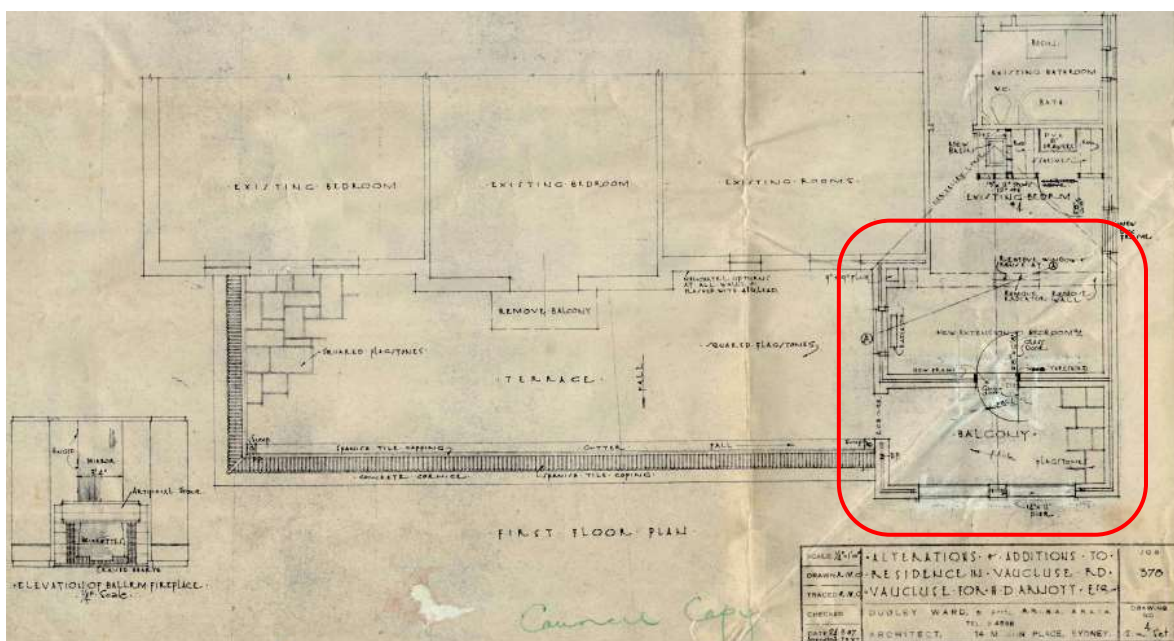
First floor plan showing extension to existing bedroom 4, including new balcony, and construction of a new first floor level terrace with Spanish tile capping
